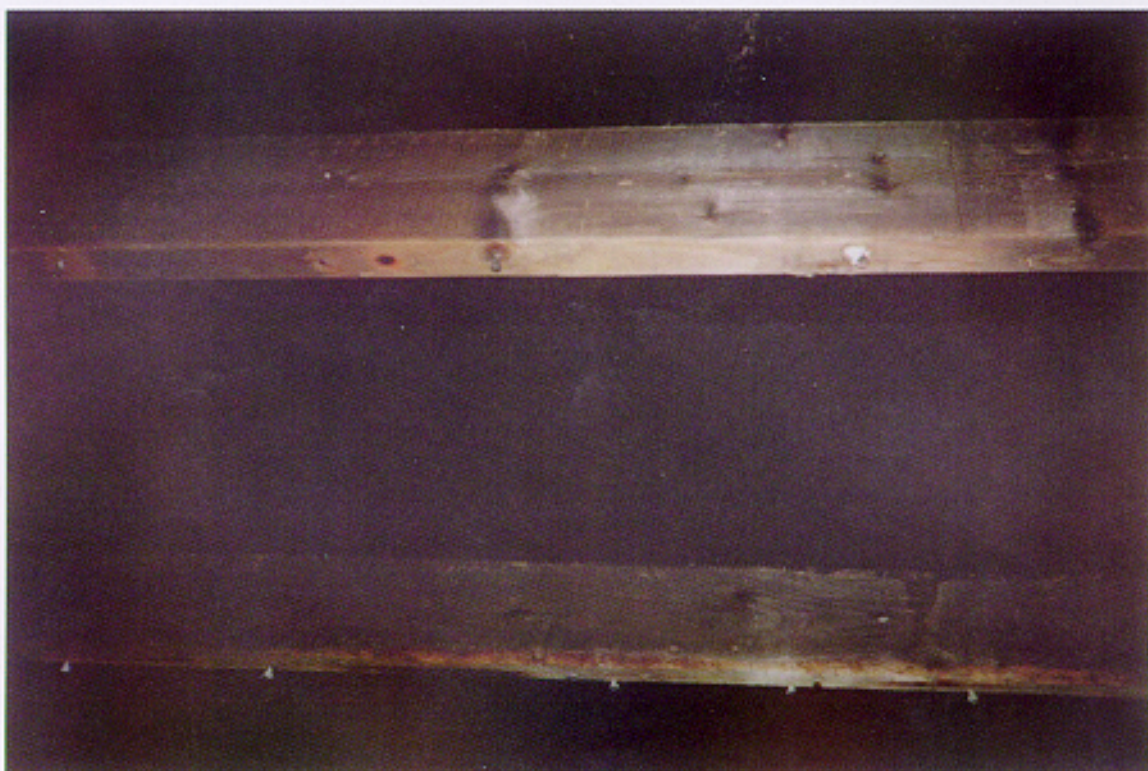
Photograph of the ceiling joists after extinguishment. Experiment 3.
